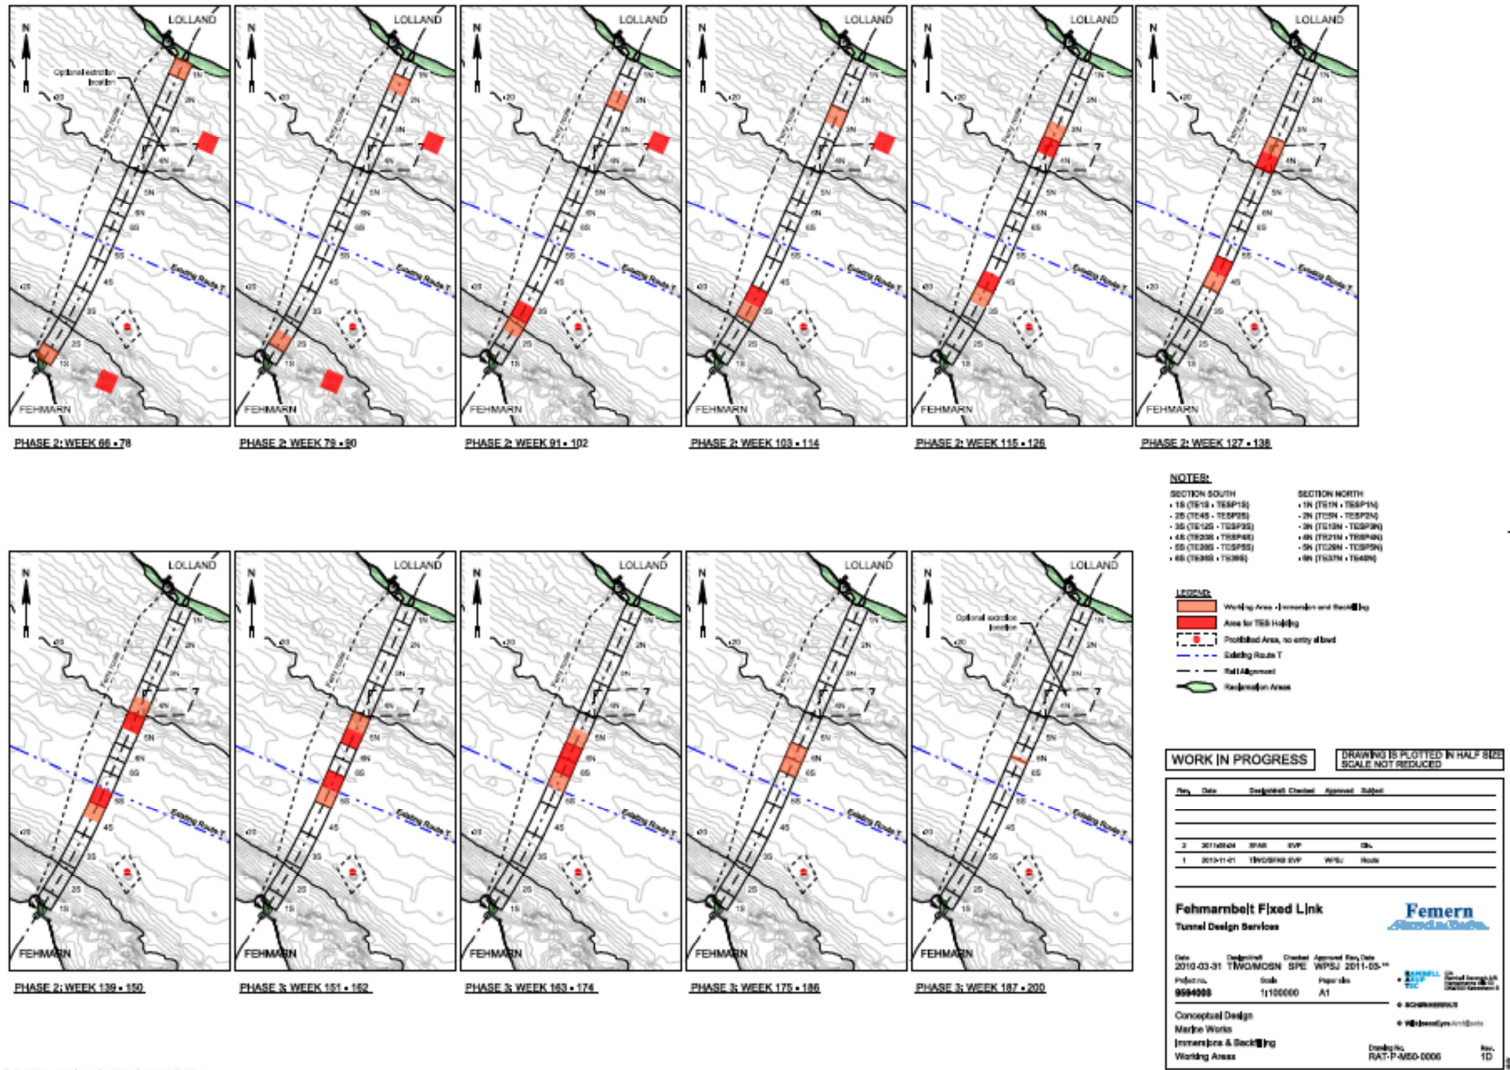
Eleven stages of immersing the tunnel and backfilling
